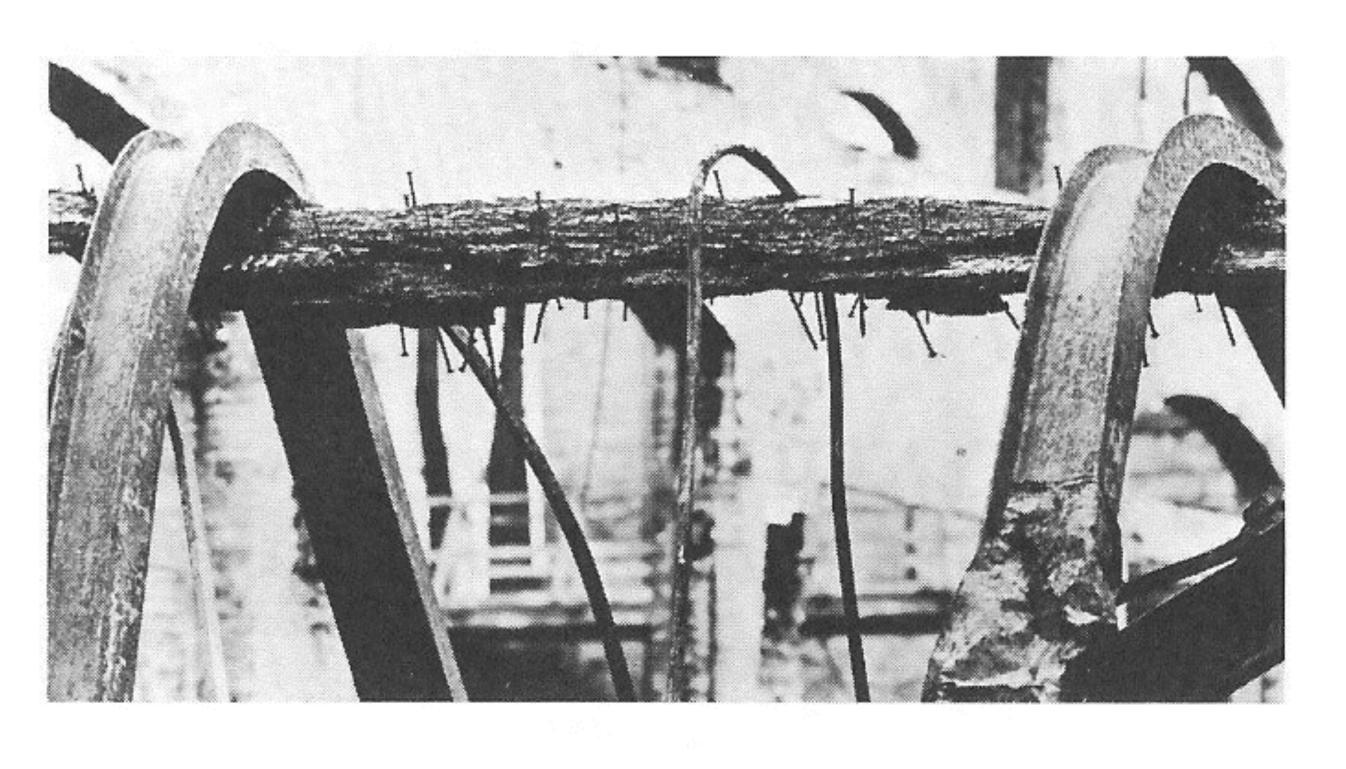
After fire scene. Shows a wood beam supporting twisted steel I-beams. (Forest Products Laboratory)
